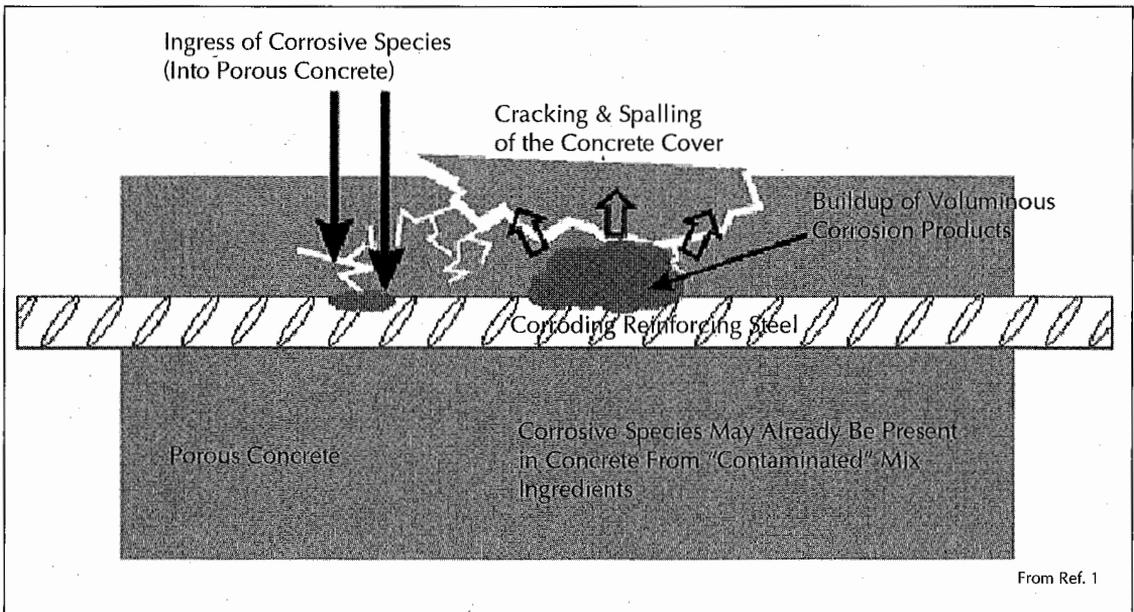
Corrosion damage in reinforced concrete.
